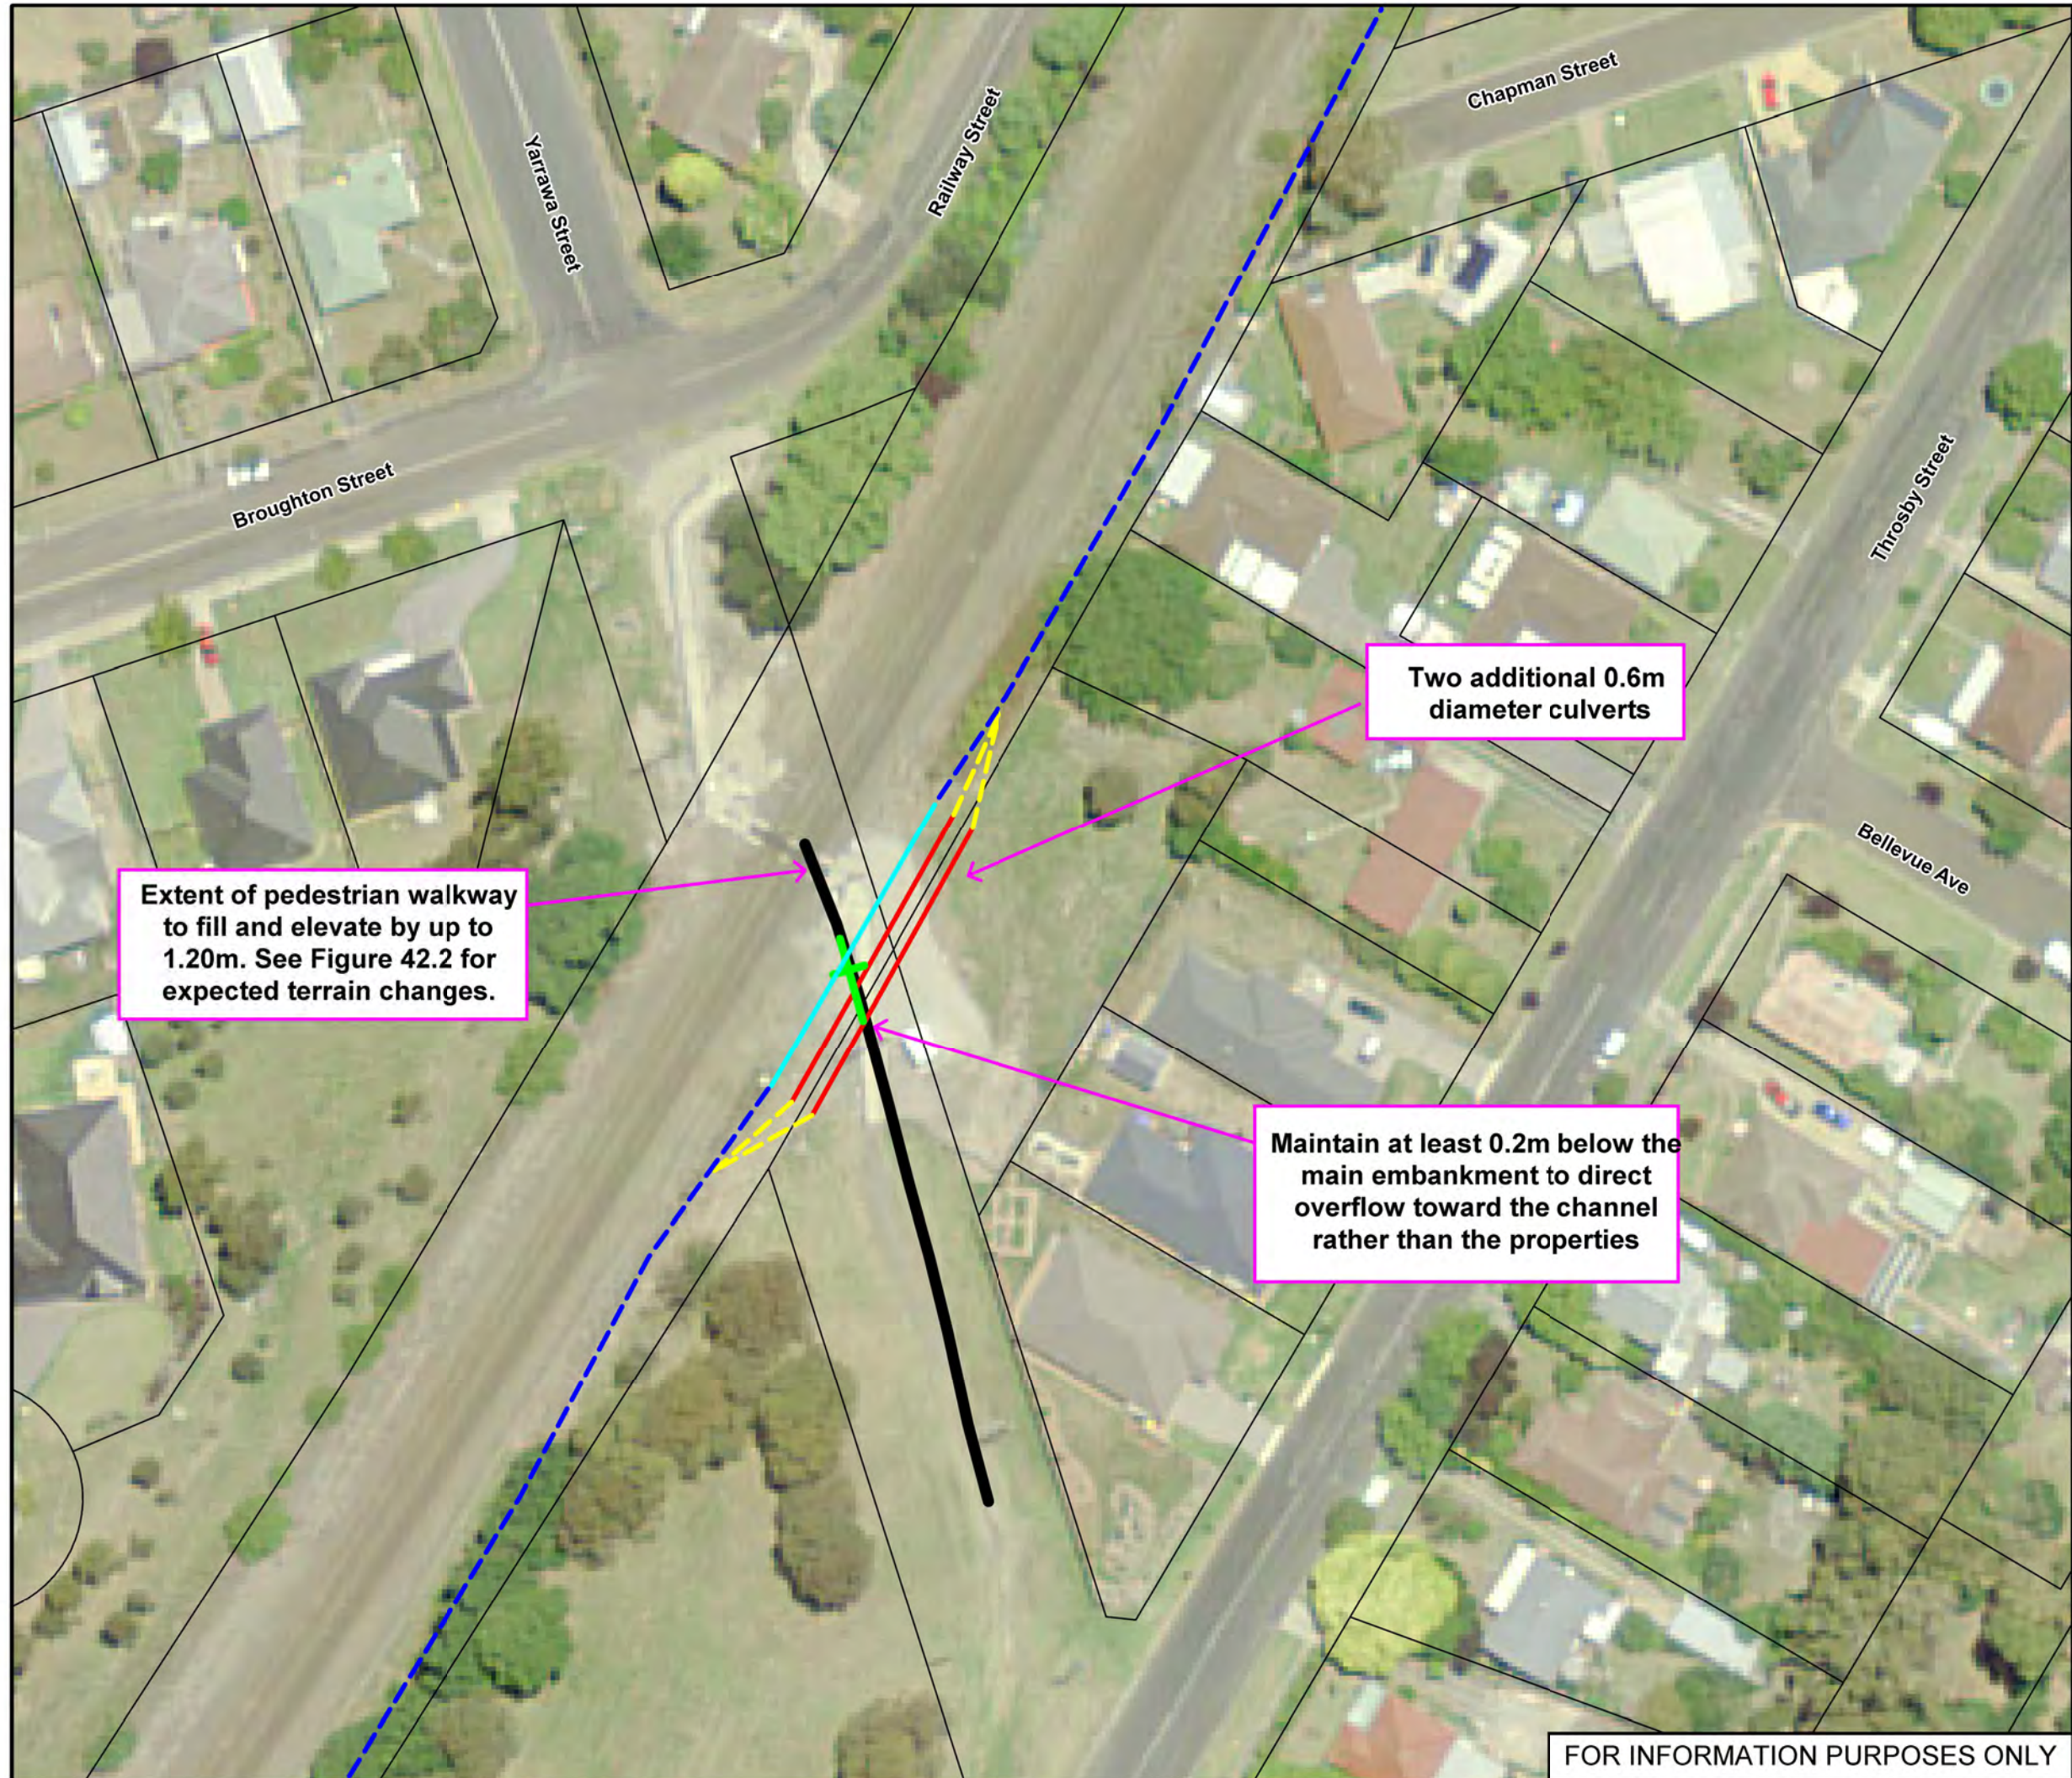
Concept Design to Lower Floodplain Elevations of Whites Creek between 6-12 Berrima Road (FM8)
